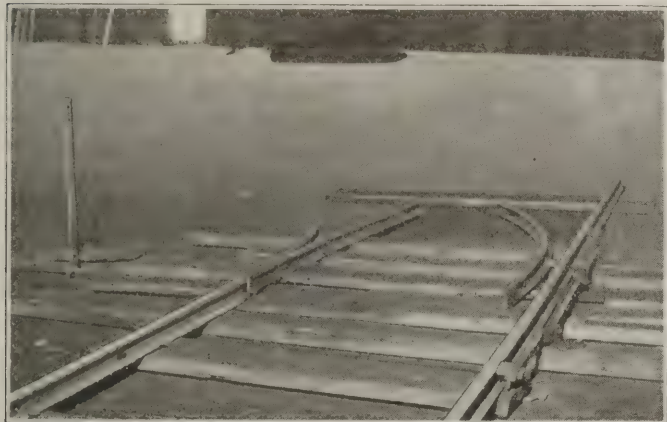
SAFETY SWITCH USED ON ROOM PARTINGS
